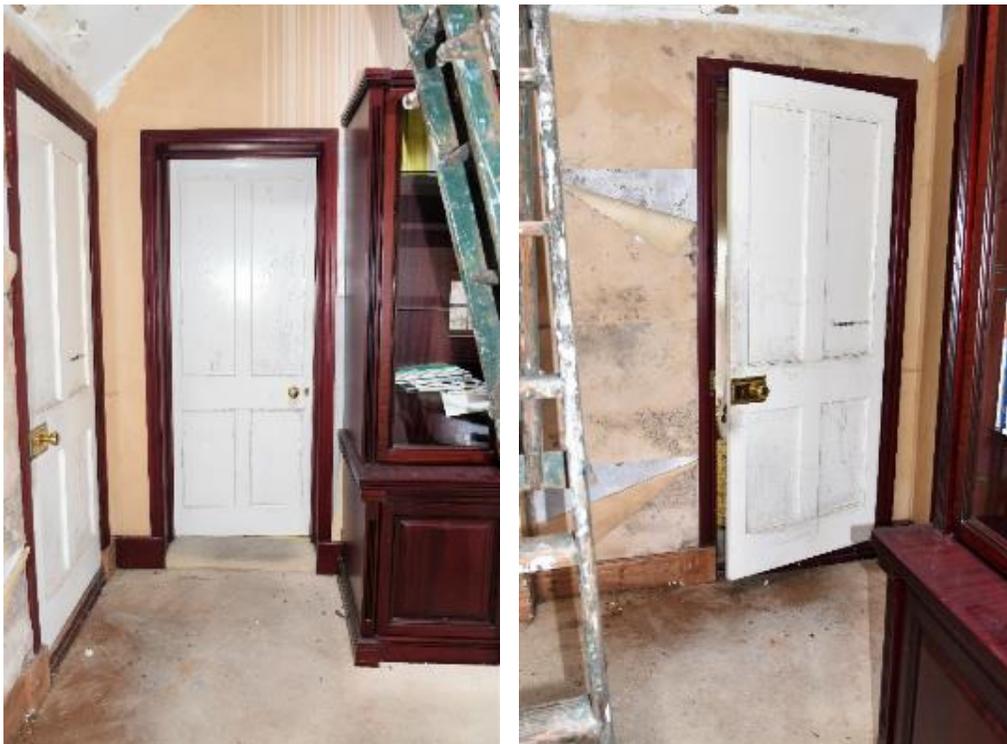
& 37 – images showing 2no. doors in the new open plan living space to be blocked up.
